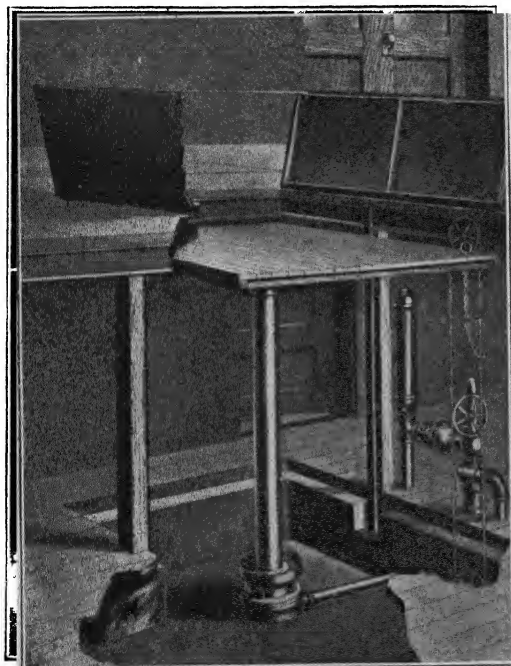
Typical Plunger Hydraulic Sidewalk Elevator
